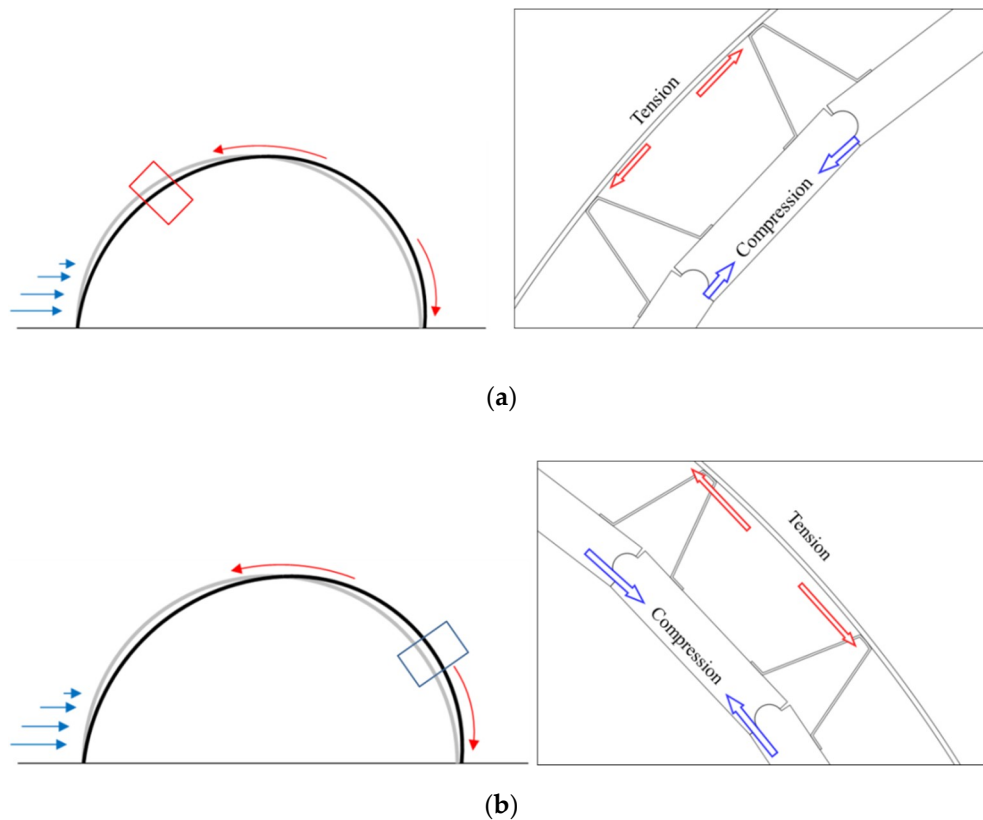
Conceptual diagram of the behavior of the one-sided backfill soil of a precast, panel-segmented arch bridge with outriggers: (a) behavior of left-side arch bridge member during one-sided backfill construction and (b) behavior of right-side arch bridge member during one-sided backfill construction.
